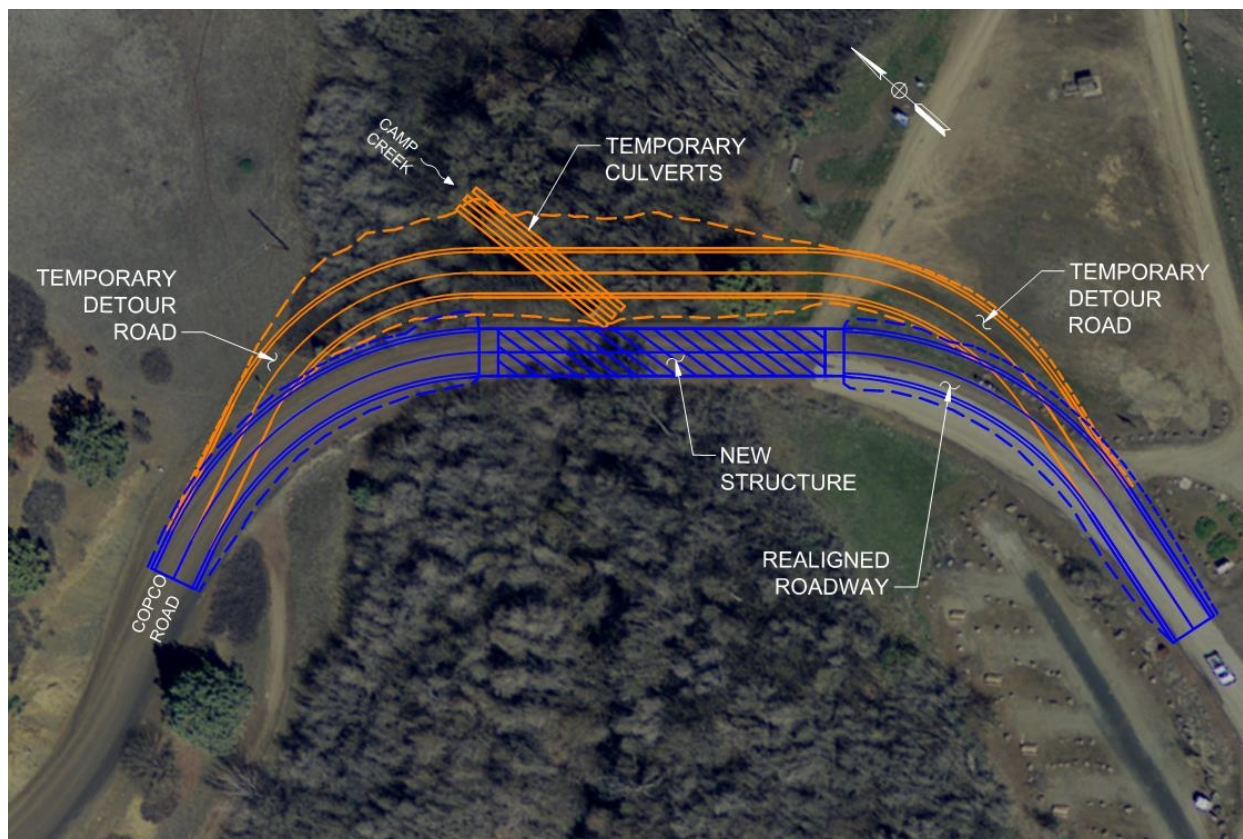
Temporary Culverts and Detour Road at Camp Creek
